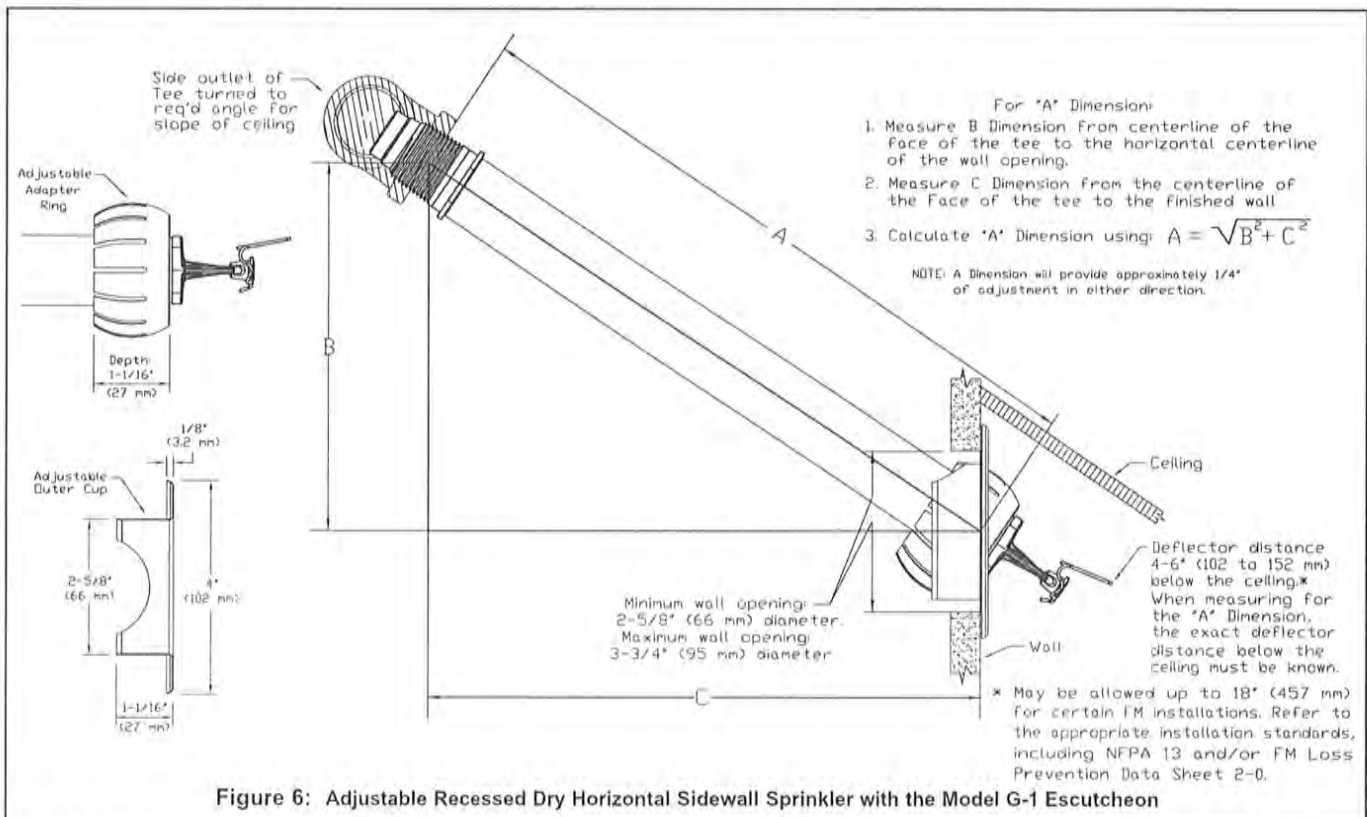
Adjustable Recessed Dry Horizontal Sidewall Sprinkler with the Model G-1 Escutcheon
